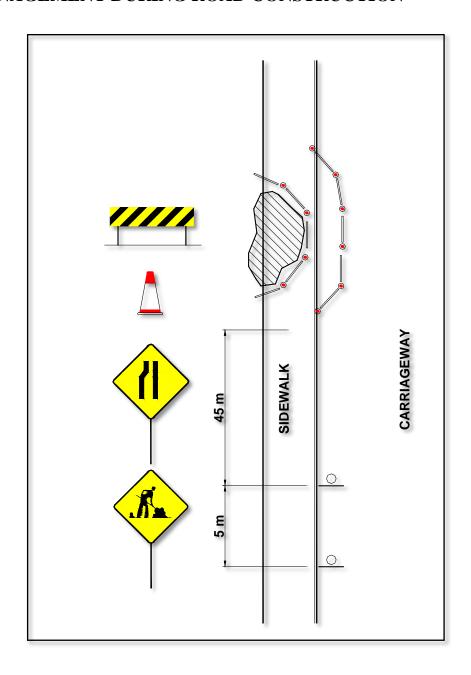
Maintenance operation of short duration on Pedestrian Sidewalk
